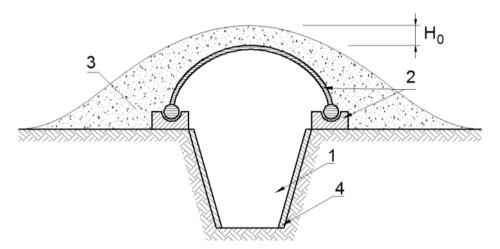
Example of concealment solution, 1-trench or shooting trench, 2-laminate cover elements, 3-soil backfill, H₀minimum thickness of backfill, 4-slope cover of excavation with handy materials or laminates.
